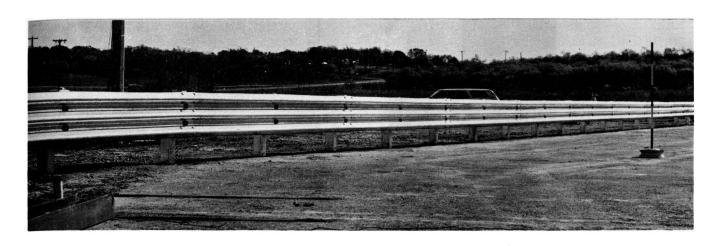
TEST AS-6 INSTALLATION PHOTOGRAPHS
